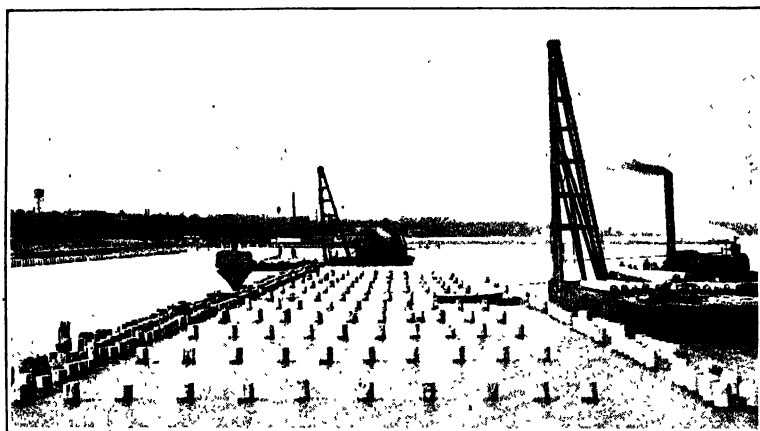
Concrete piles driven for Pennsylvania Railroad ore dock at Cleveland, Ohio.
